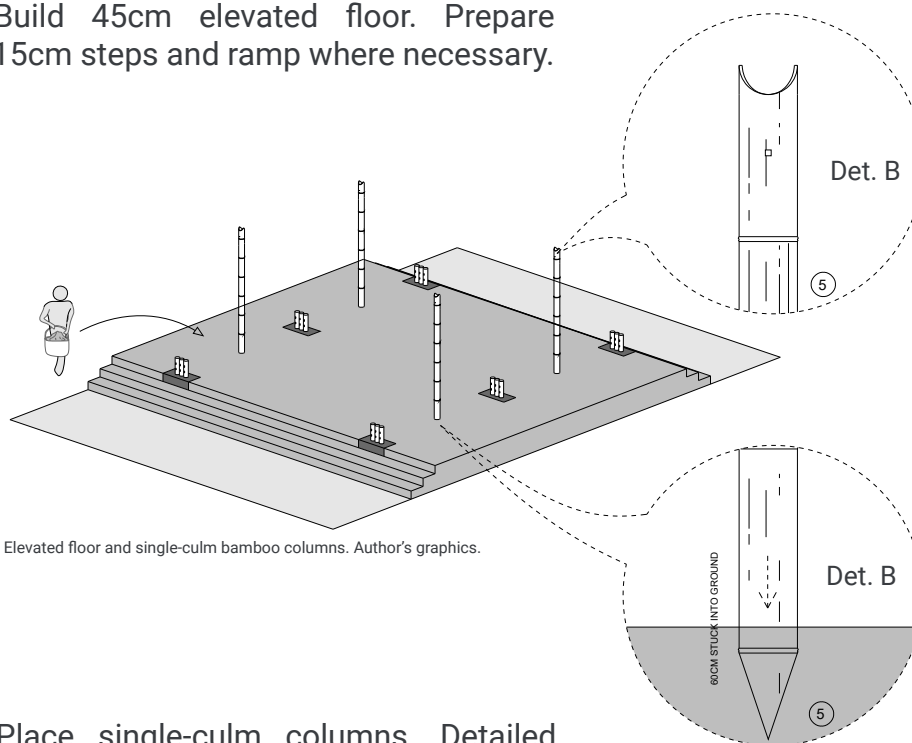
Elevated floor and single-culm bamboo columns. Author's graphics.
